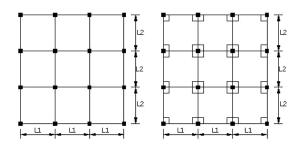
Plan of slab with drop and without drop Where, L1 and L2 are panel sizes
